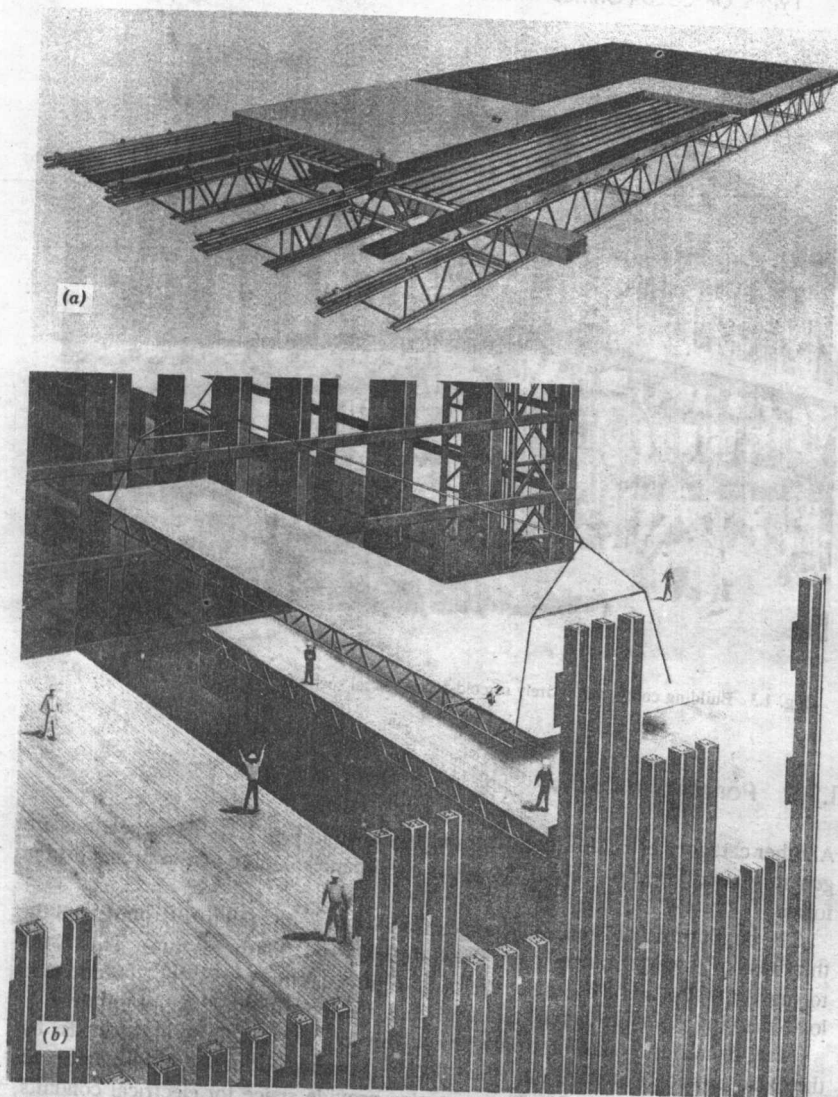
(a) Composite truss-panel system used in World Trade Center Building, New York City; prefabricated by Laclede Steel Company. (b) Placement of prefabricated composite floor panel section in World Trade Center Building. (Port of New York Authority.)
